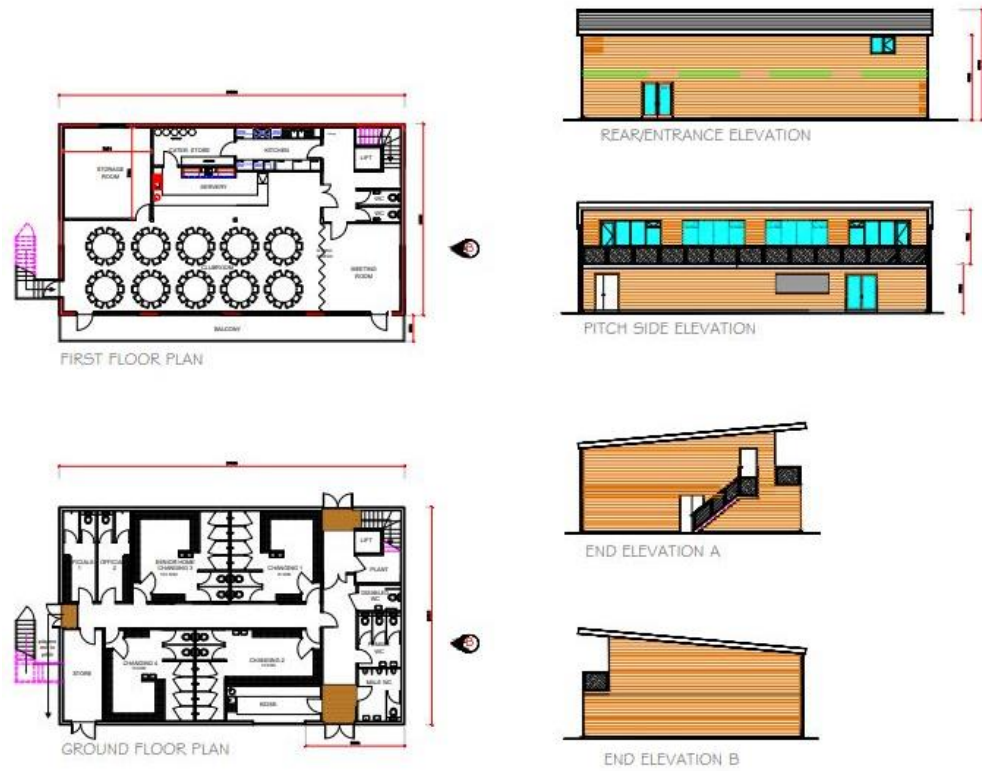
Proposed pavilion floor plan and elevations – previously refused application (21/05790/FULL1).
